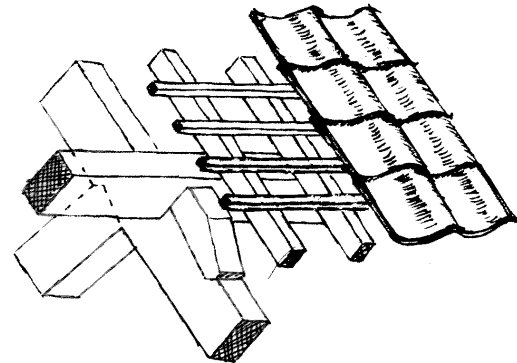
Roof construction (Gmelig Meijling, 1953, P.31)
